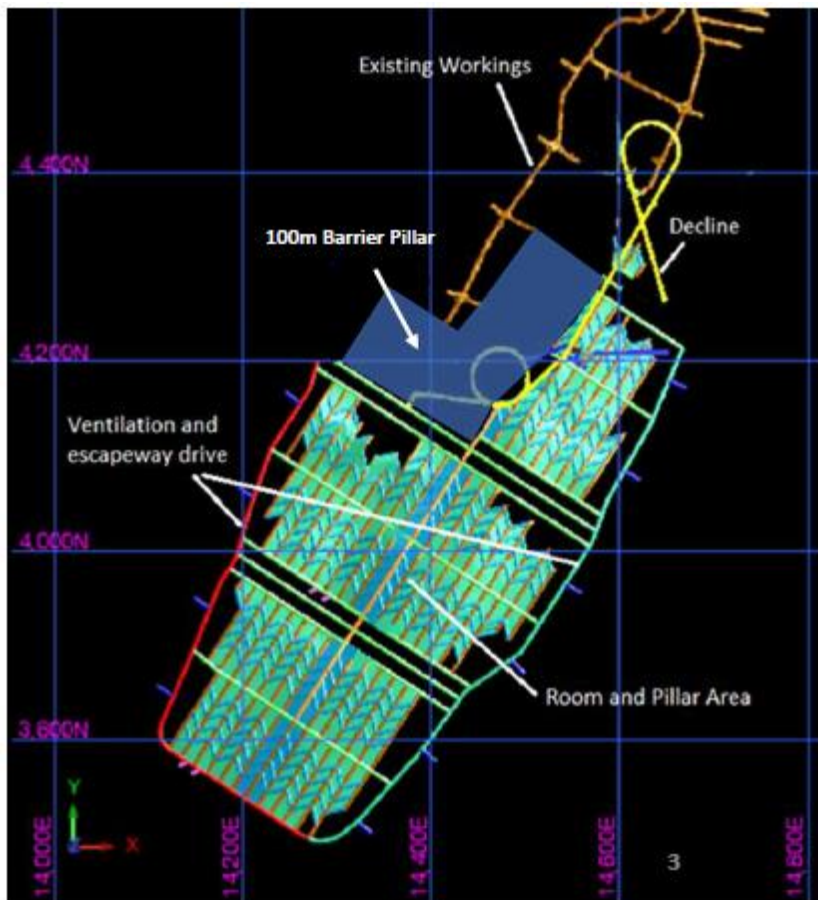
Proposed Underground Workings Relative to the Barrier Pillar.
